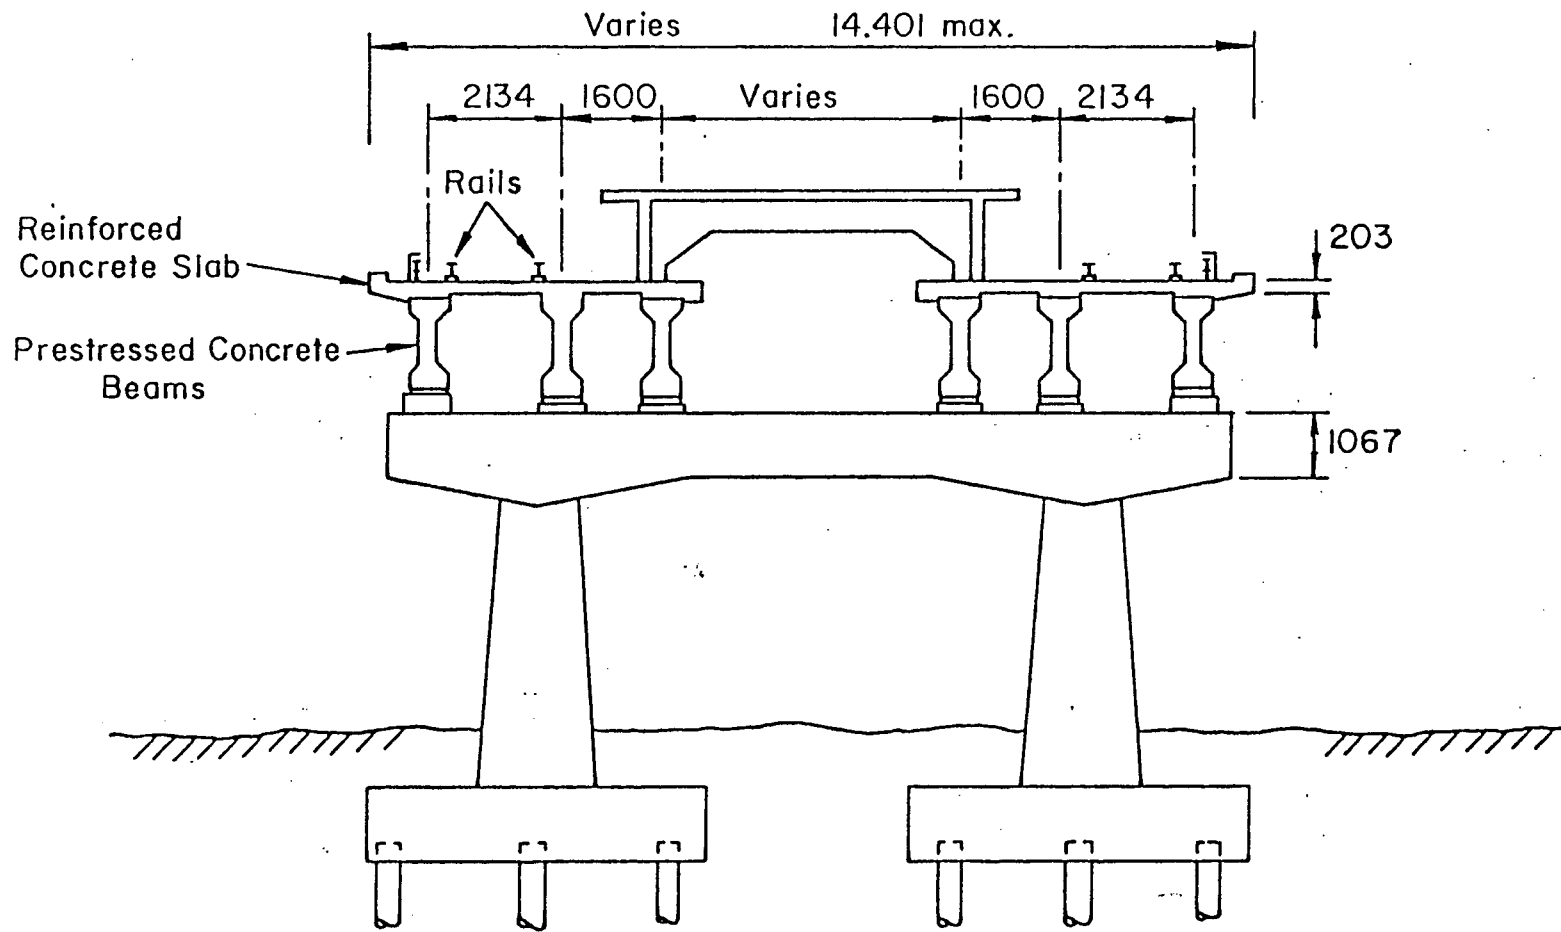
Cross-Section of the Collingswood and Westmont Viaducts in the Vicinity of the Station
